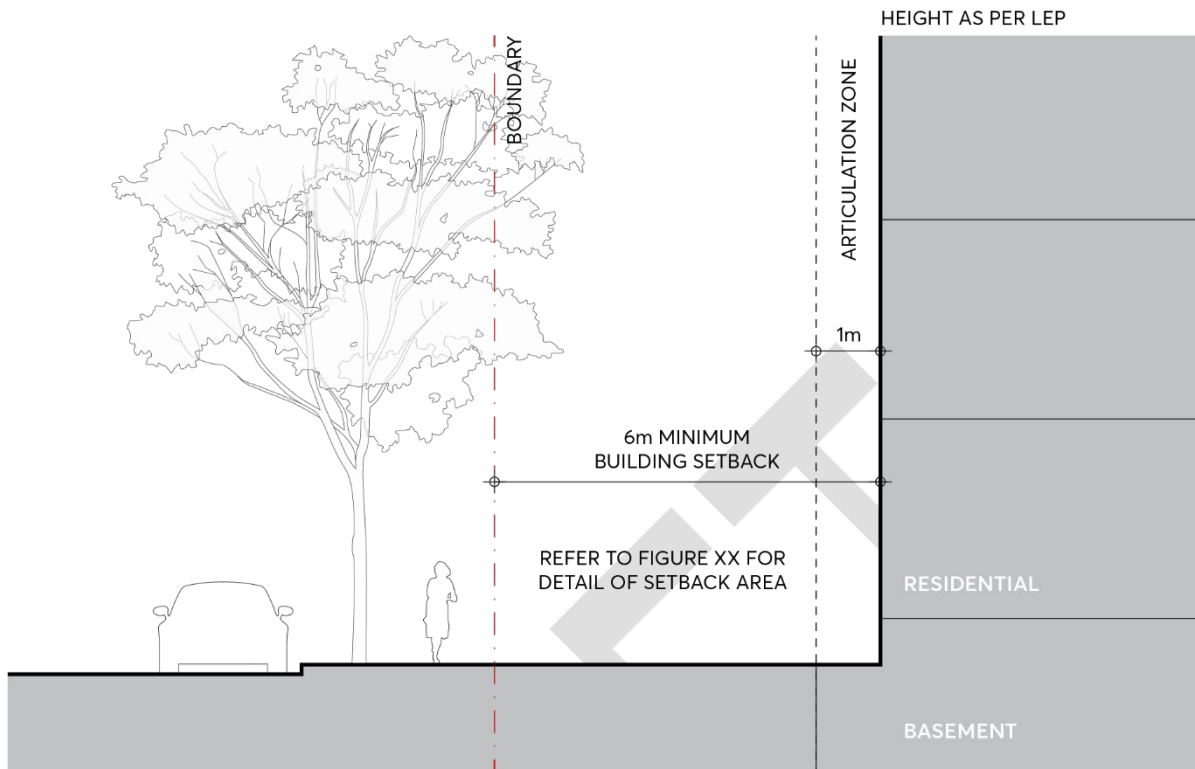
Street Setbacks - Residential Ground Floor street frontage
